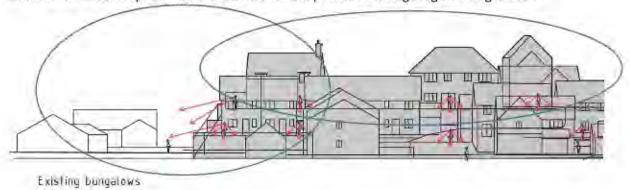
South Site Section FF showing the effect on existing houses and overlooking from the upper terraces. The upper circle shows the raised upper level of houses.
